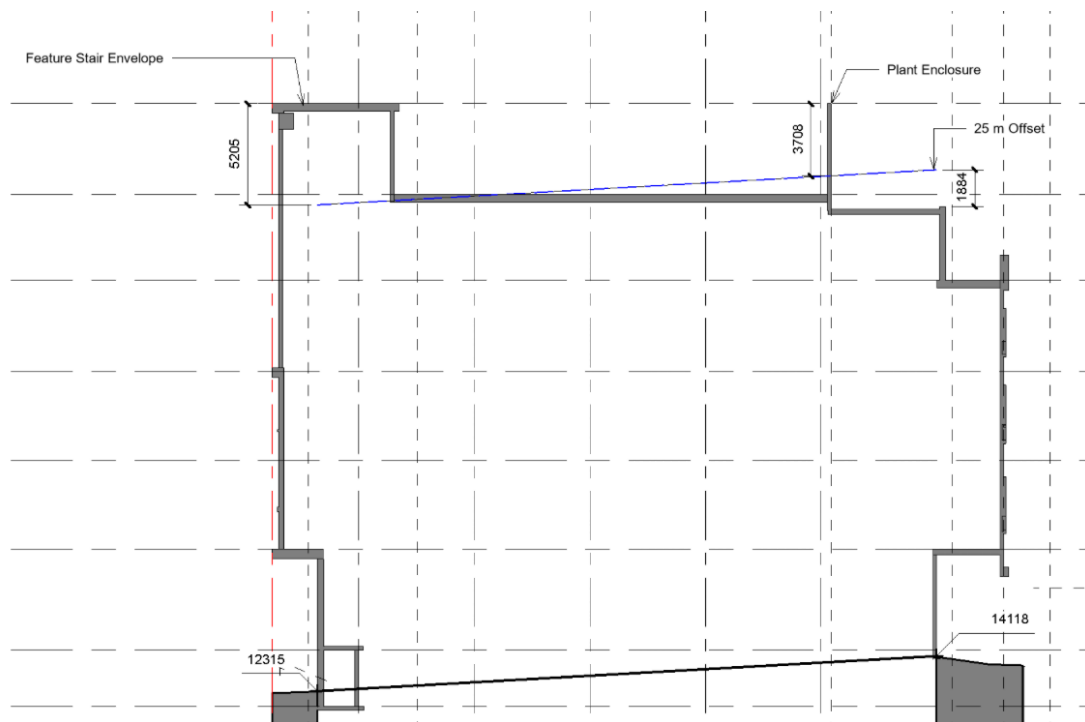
Cross section from 3D model showing new building 'feature stair' element above height control on Broadway (Tricon)
